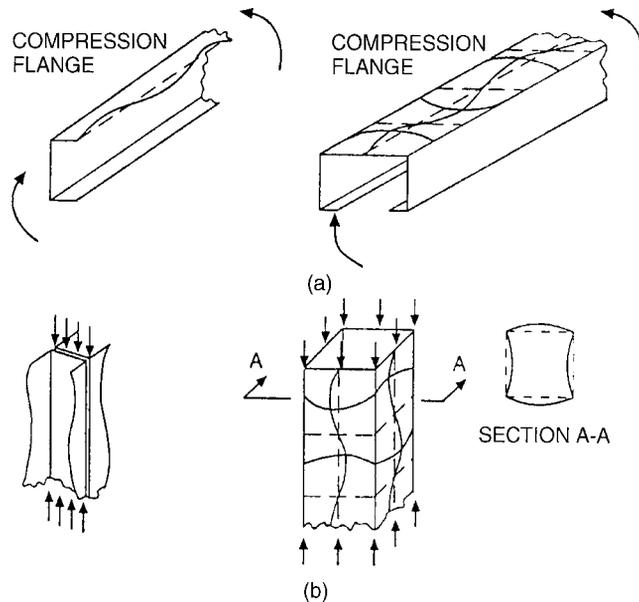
Local buckling of compression elements. (a) In beams. (b) In columns. (Source: Commentary on the North American Specification for the Design of Cold-Formed Steel Structural Members, *American Iron and Steel Institute*, Washington, D.C., 2001, with permission.)
